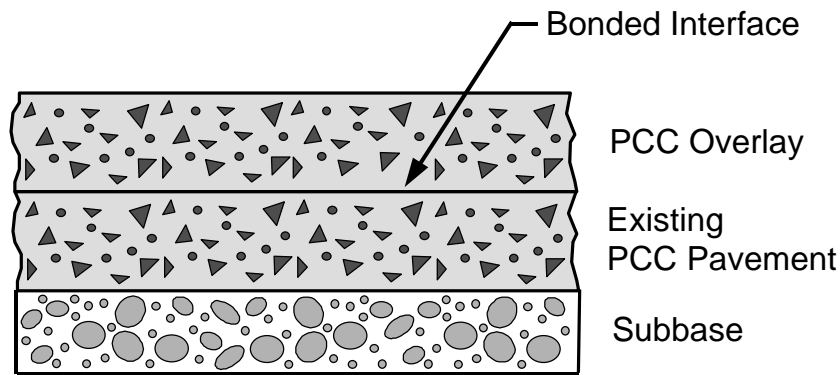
Bonded rigid pavement overlay.⁽¹⁾
